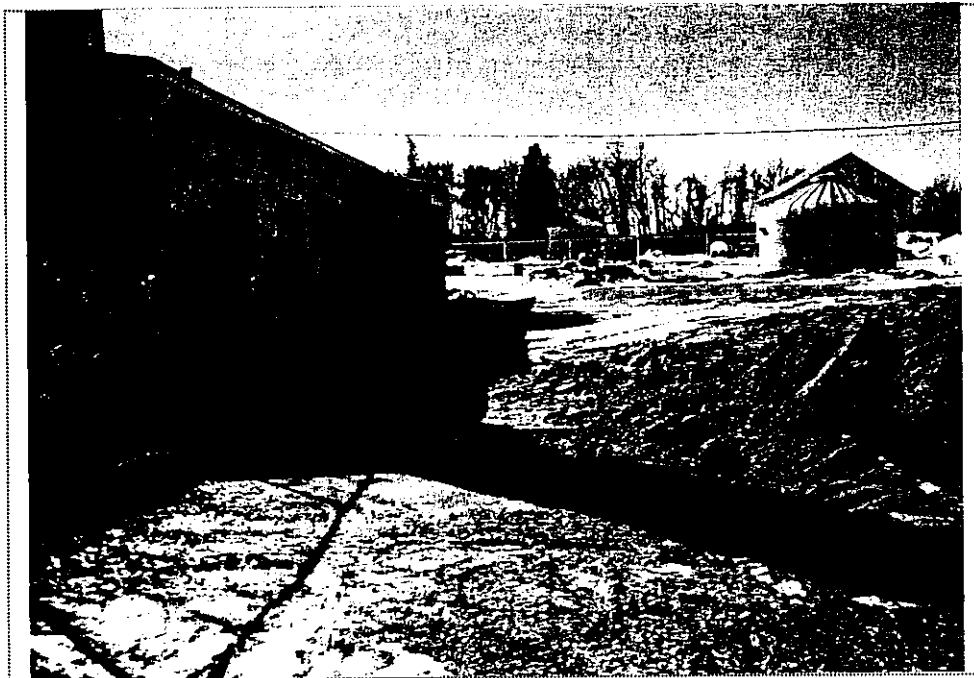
View of UST-9401 site restoration (looking southwest).
